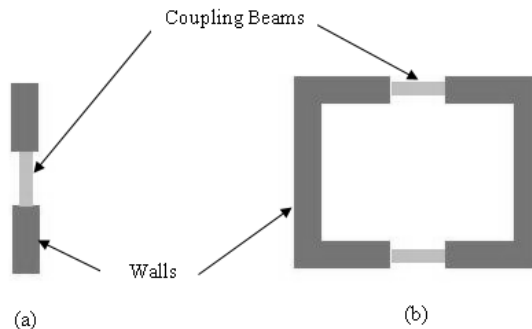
Typical coupled wall configurations: (a) Planer wall and (b) Core wall (Adhikari, 2015)
